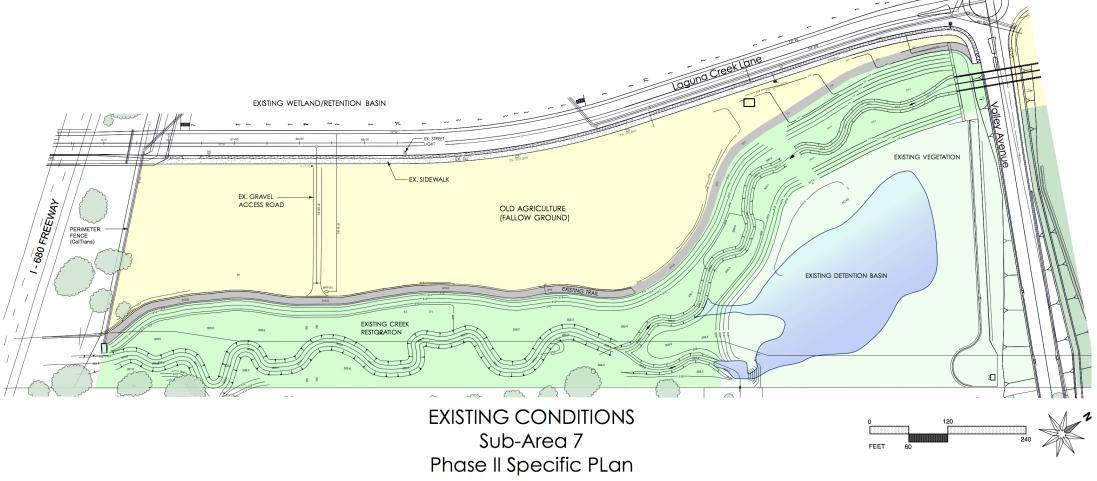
SUB-AREA 7 - EXISTING SITE CONDITIONS
